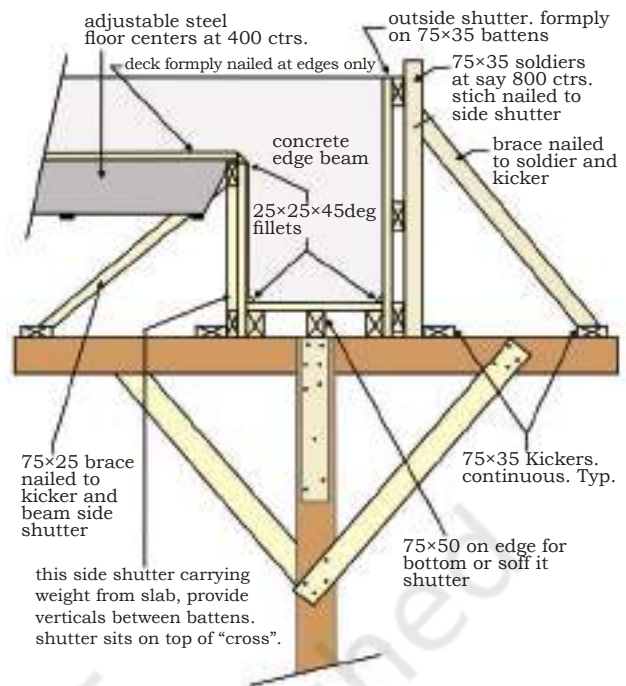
(b): Diagram explaining shuttering for beams and RCC Floor
